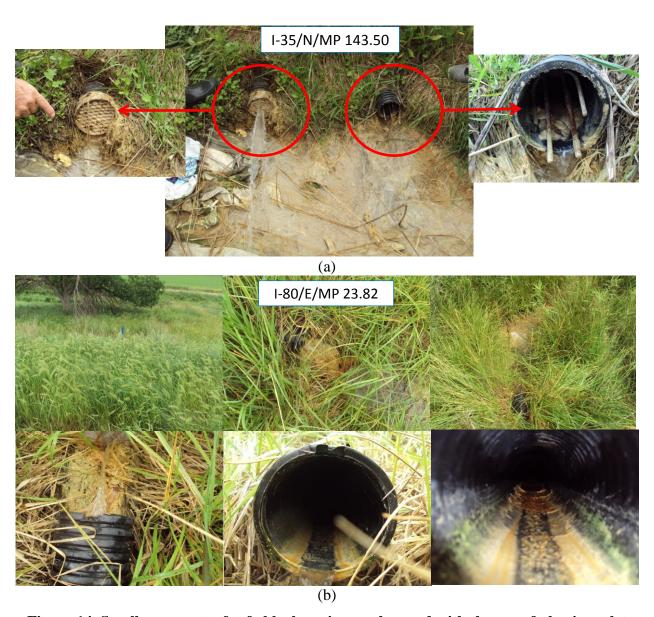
Smaller amount of tufa blockage issues observed with the use of plastic outlet pipe in newly constructed JPCP sites containing RPCC base materials: (a) I-35/N/MP143.50 and (b) I-80/E/MP23.8
